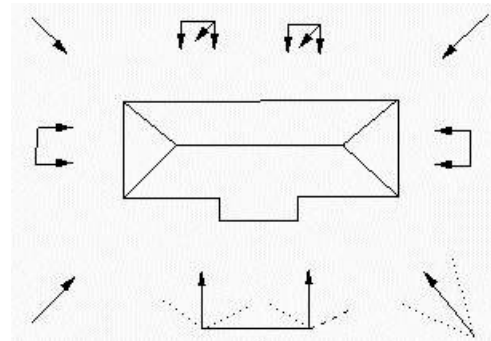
Ground plan of a stable bundle block arrangement all around building, as recommended in the 3x3 rules
